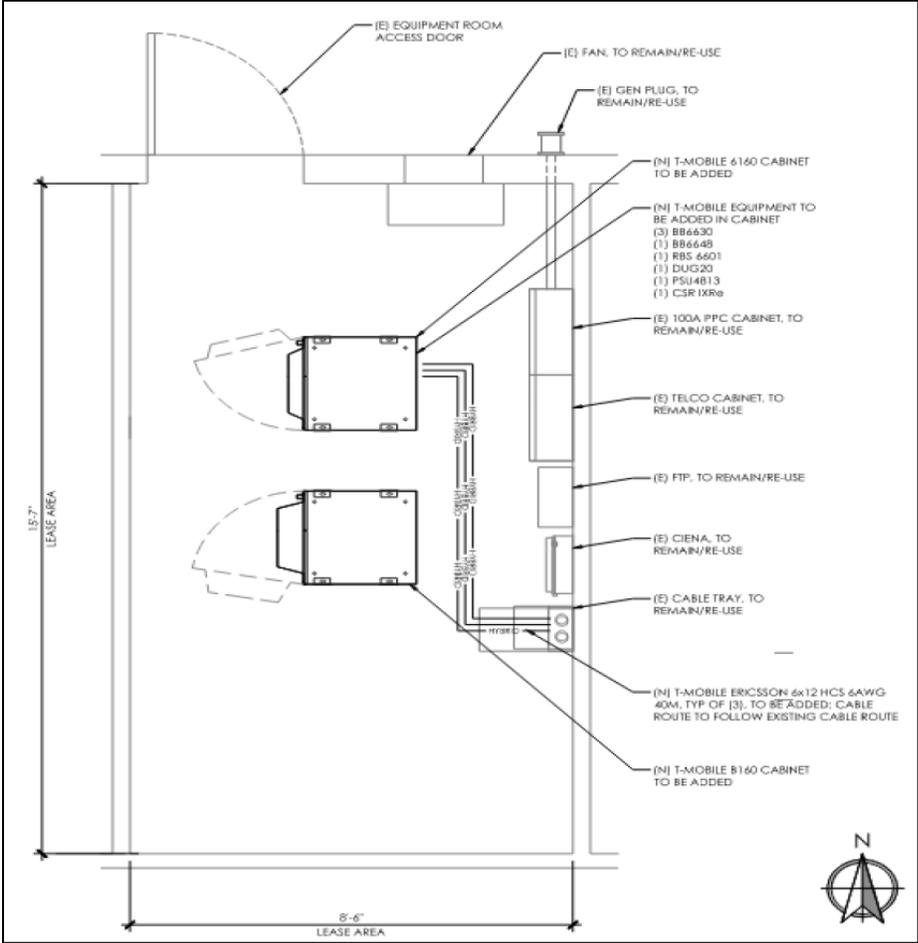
Equipment layout plan (Source: CUP Renewal Sketch).
